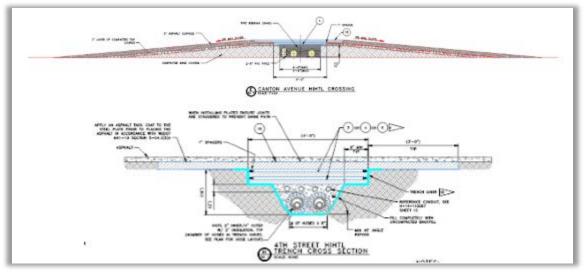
Canton Avenue and 4th Street Transfer Line Road Crossings
